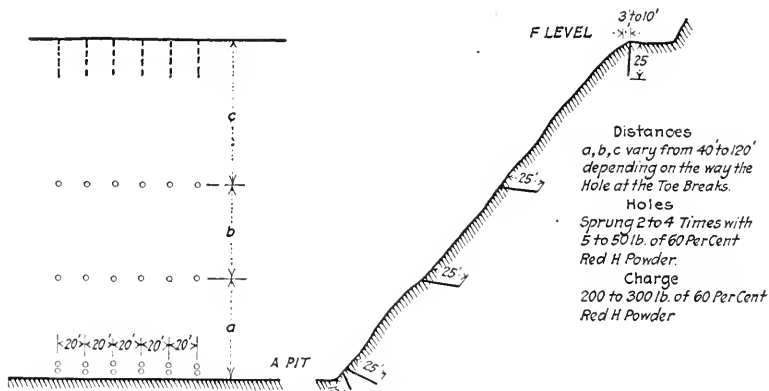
Drilling and blasting 240-ft. bank; tripod drilling.
